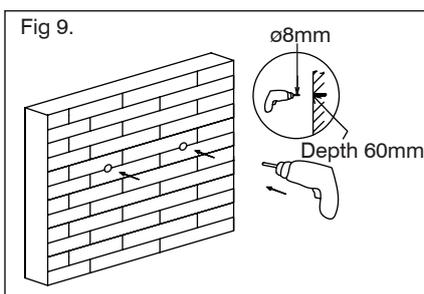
Drill two ø8mm holes approx. 105mm spacing with depth of 60mm
